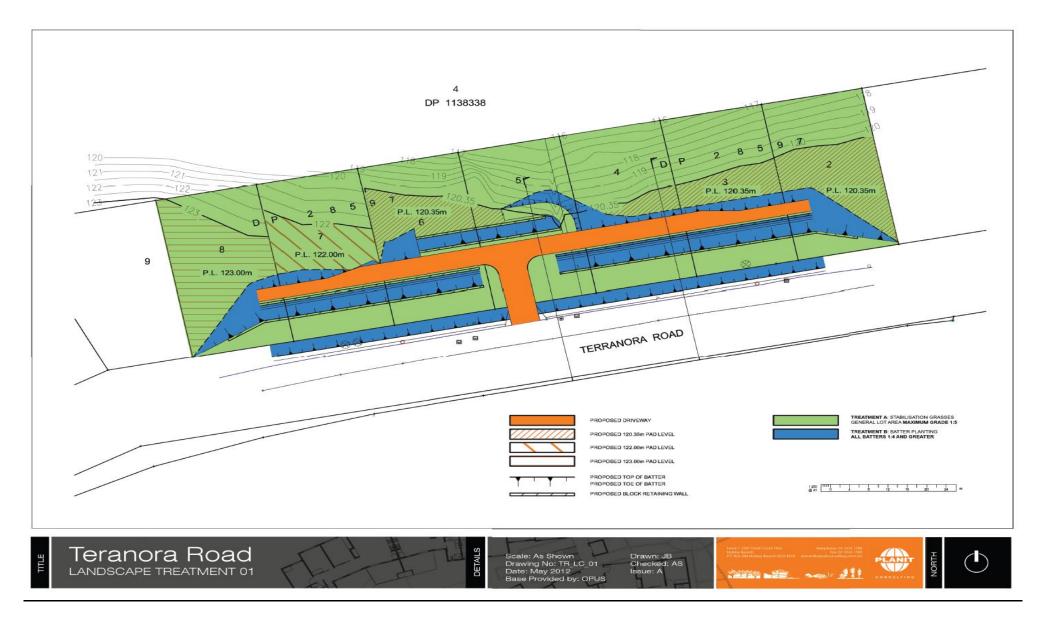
Proposed Development Concept Showing the Extent of earthworks on Each Proposed Allotment
